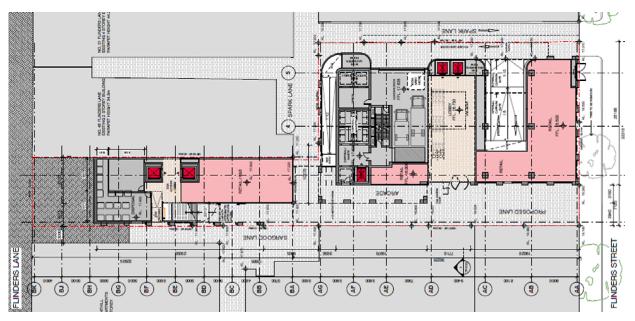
Proposed ground floor plan (source: application plans prepared by Bates Smart)
